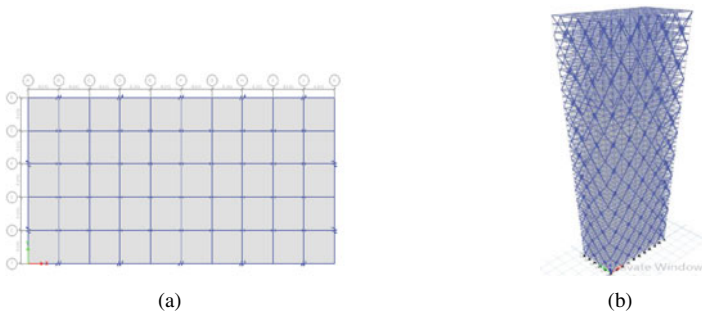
a Plan of the diagrid steel system with damper. b Plan of the diagrid steel system with damper
